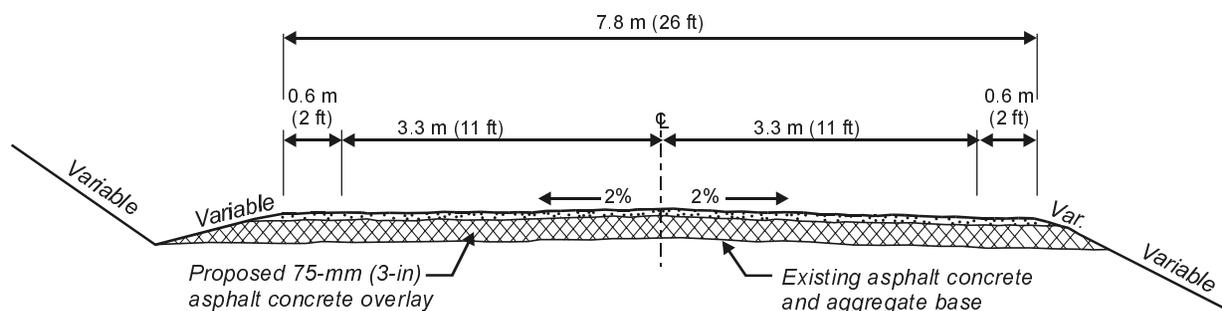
Typical cross section, rehabilitation of MP 5.3 to MP 10.7.
